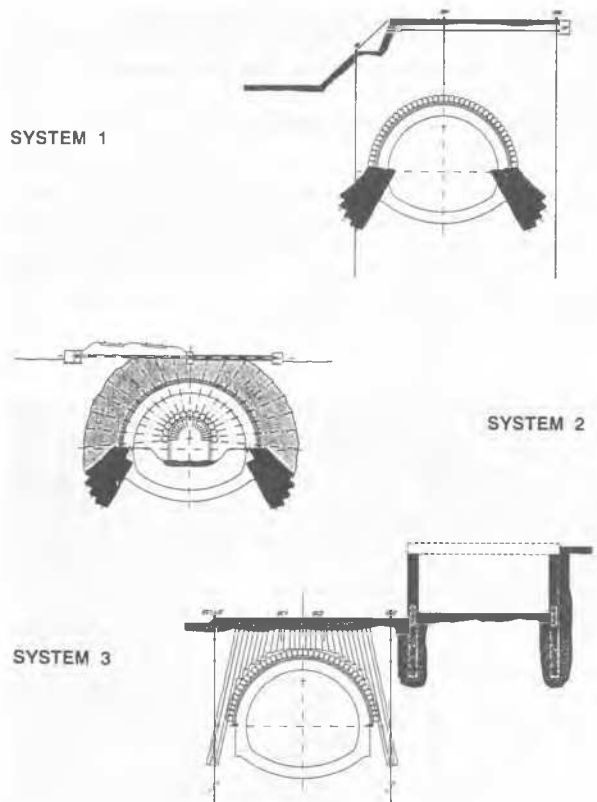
Ground treatment and pre-support methods adopted for the tunnel excavated in 3 partial cross sections: crown, bench, invert.
